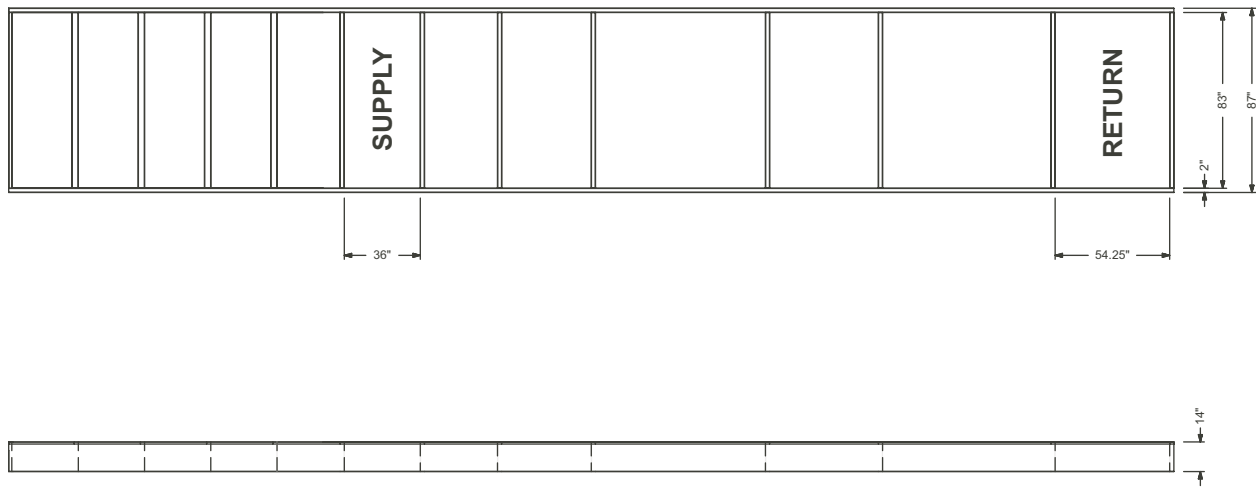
GENERAL ARRANGEMENT DRAWING
